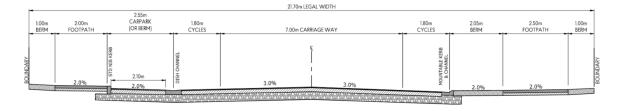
Typical Cross-Section (A) Collector – 21.7m With Cycleway and Carpark
